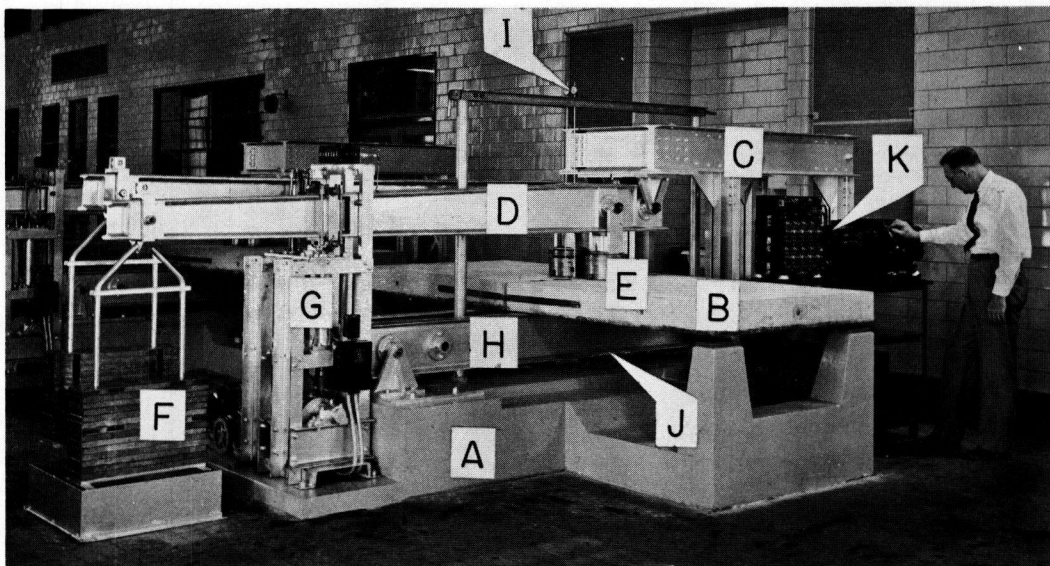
Testing machine (A, reinforced concrete base; B, test specimen; C, structural steel frame; D, loading lever; E, loading pad; F, adjustable load of lead weights; G, cam and lift-rod mechanism; H, specimen support beam; I, micrometer dials; J, SR-4 strain gages; and K, oscillograph recording equipment).
